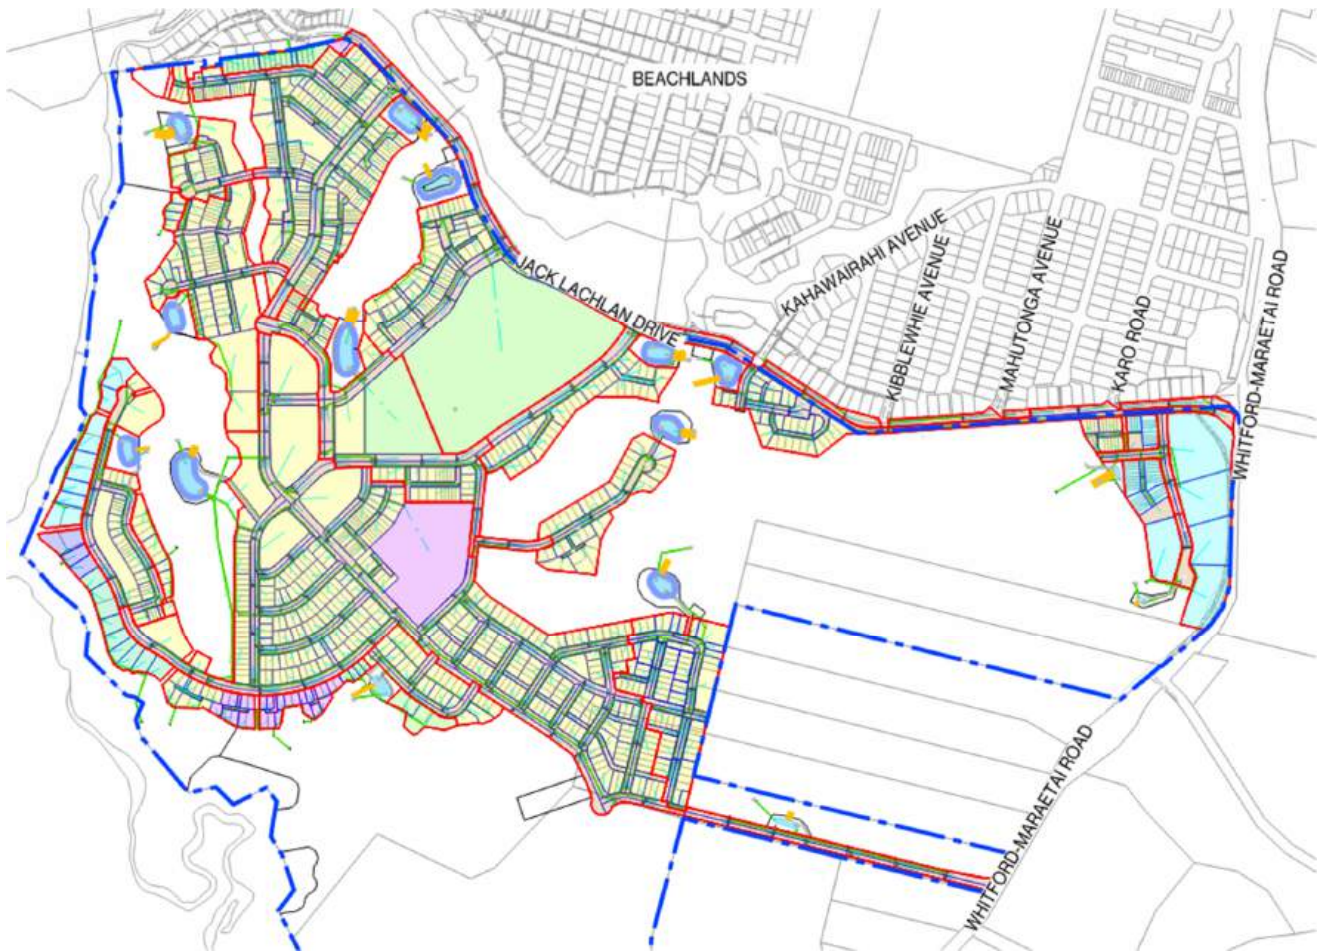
Developed site sub-catchment layout plan. (Harrison Grierson, 2026)
